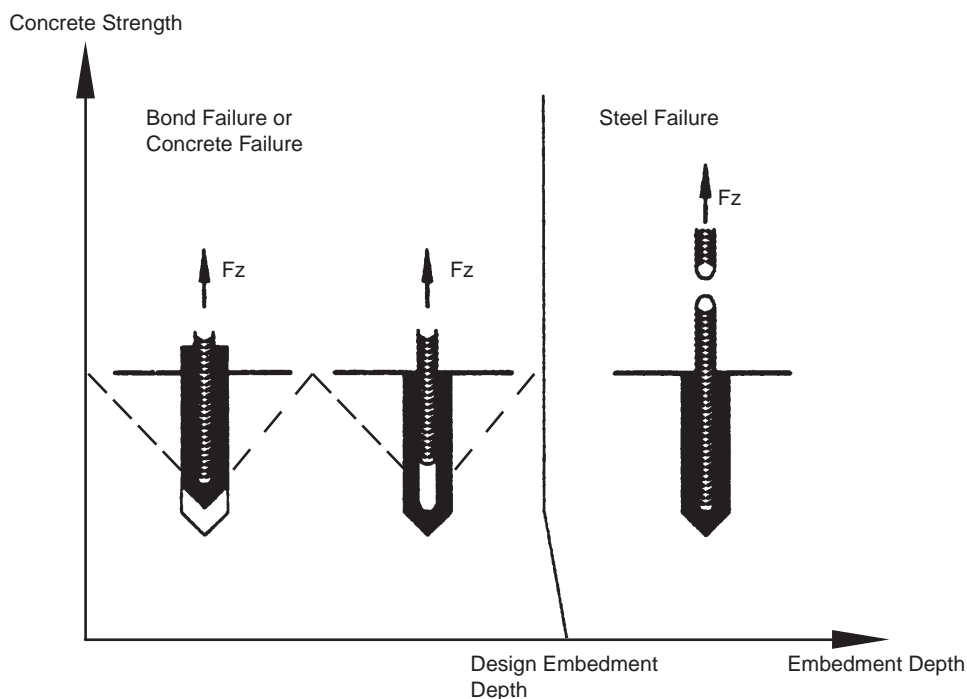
Expected failure modes for rebar installed in reinforced concrete
